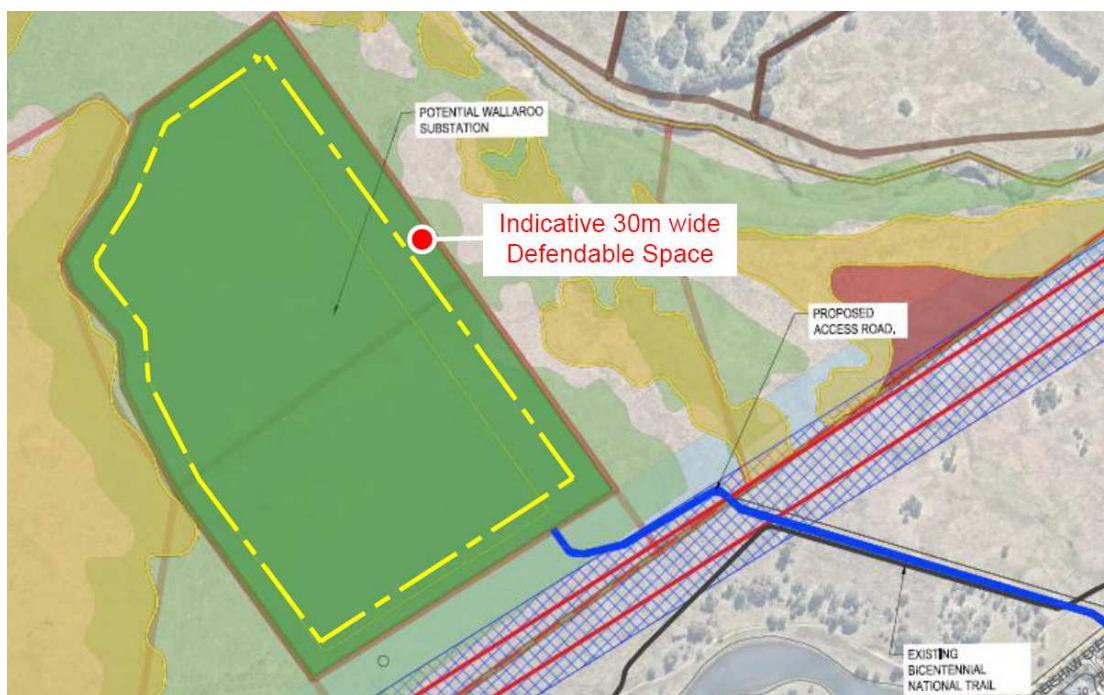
Plan of indicative Defendable Space to future Electricity Assets.
